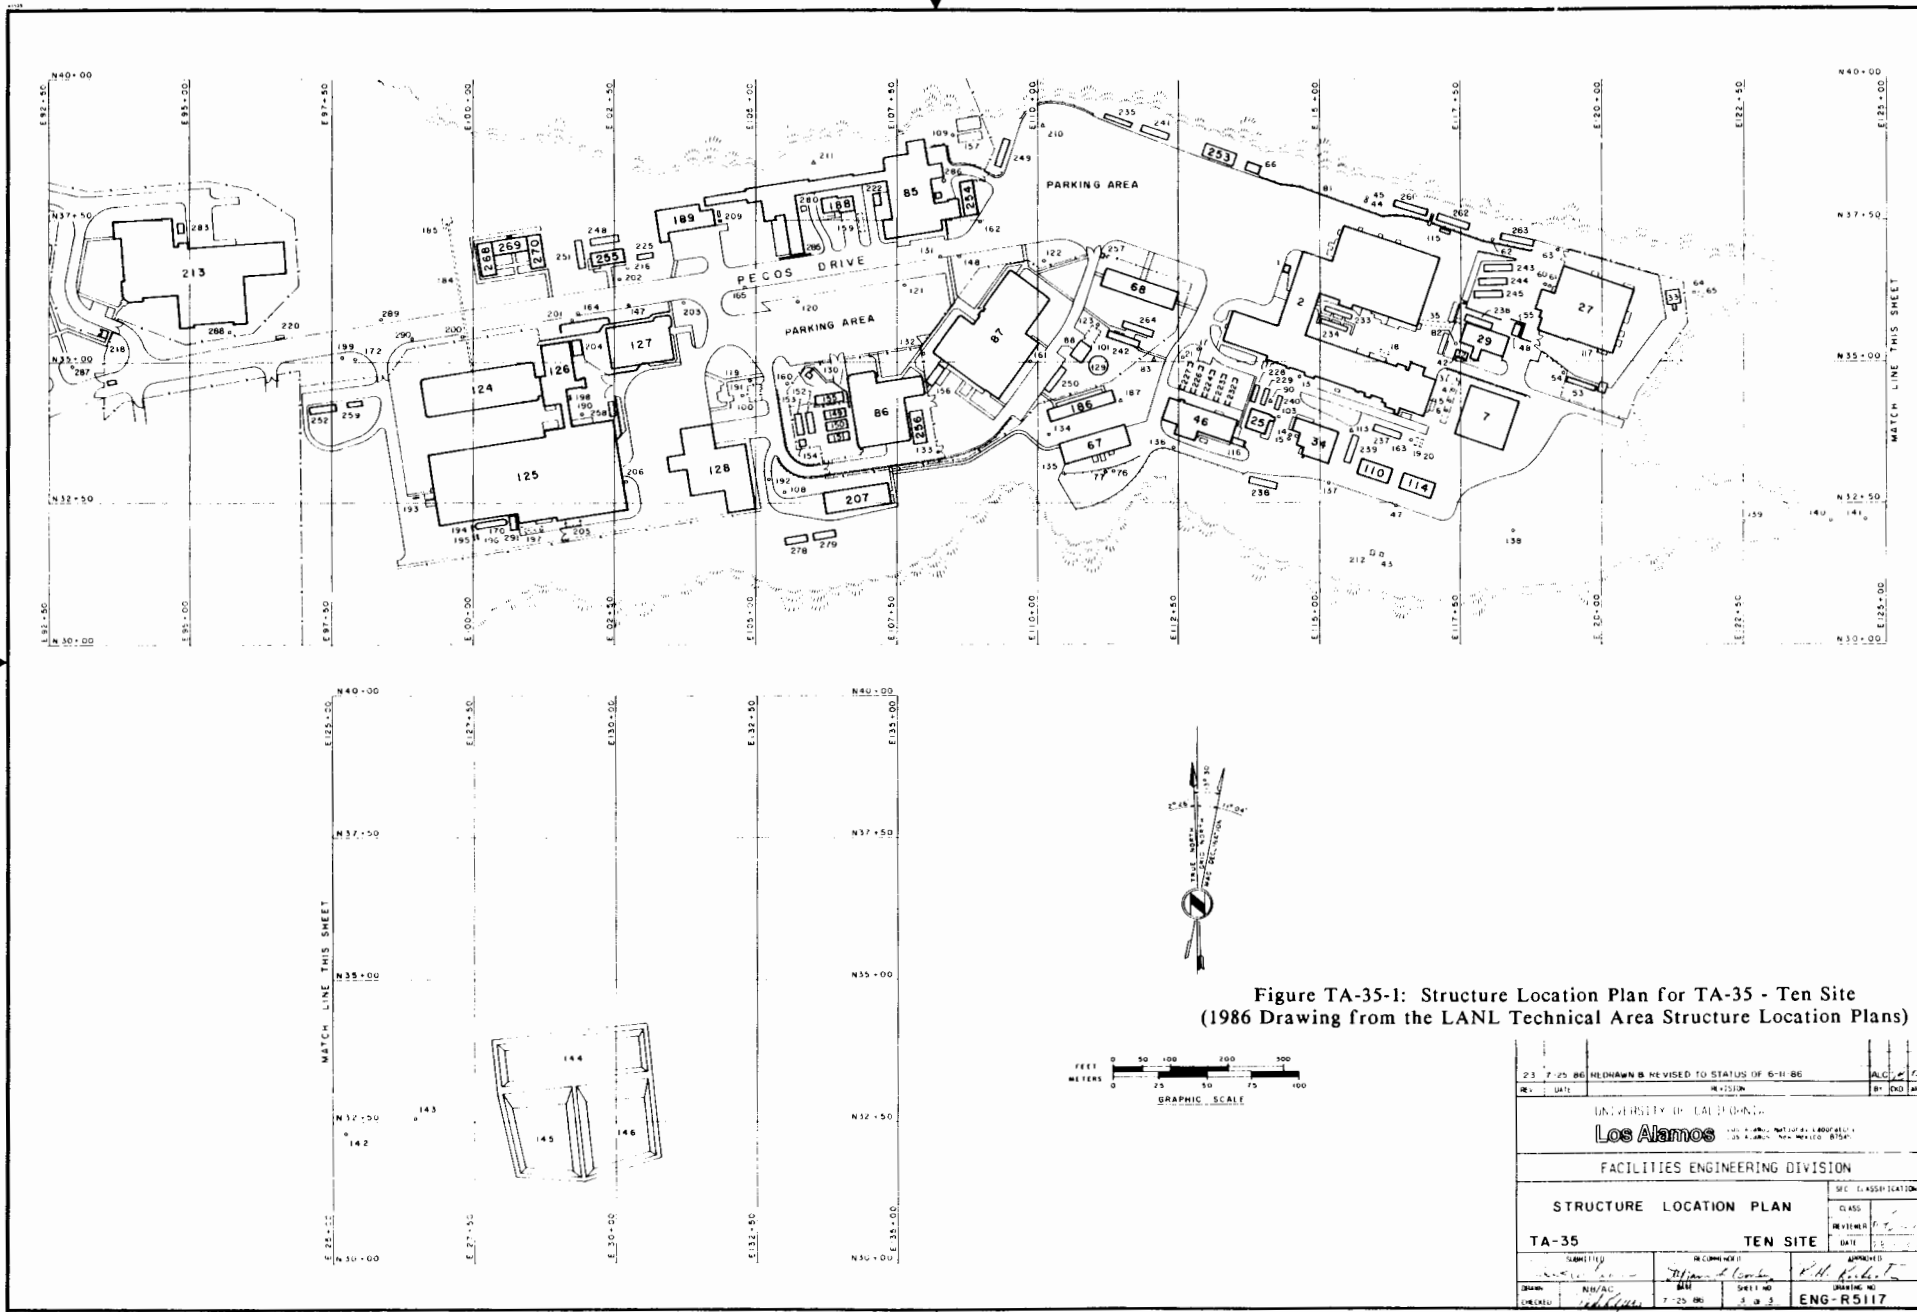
Structure Location Plan for TA-35 - Ten Site (1986 Drawing from the LANL Technical Area Structure Location Plans)
